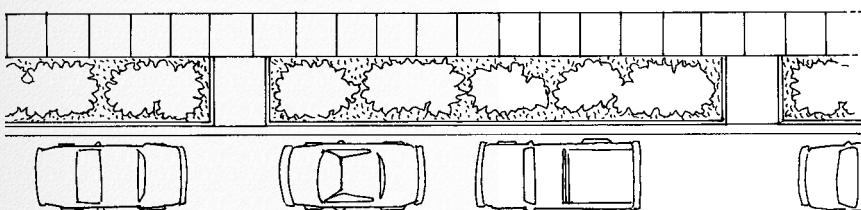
If on-street parking is permitted, periodic curb ramps along a planting strip can facilitate pedestrian access onto the sidewalk.
